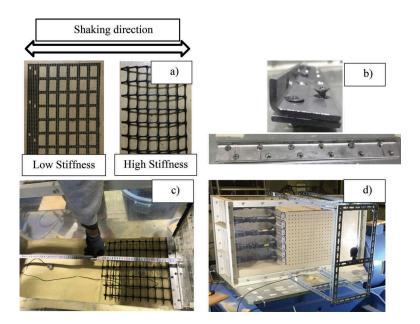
a) Model geogrid reinforcements b) Reinforcement connection detail c) placement of reinforcement and accelerometer and d) constructed geogrid reinforced soil wall.
